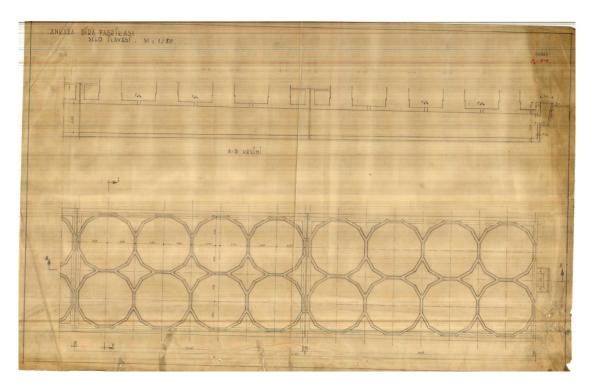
Drawing of the second addition composed of 8 dodecagon storage units, Plan, New Construction Section in General Directorate of TEKEL, 1971 (Source: TTA Archive)
